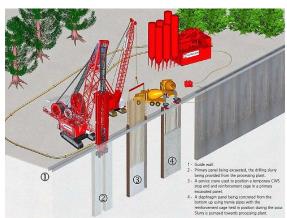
Construction steps of a slurry wall (Soletanche Bachy, 2018)
